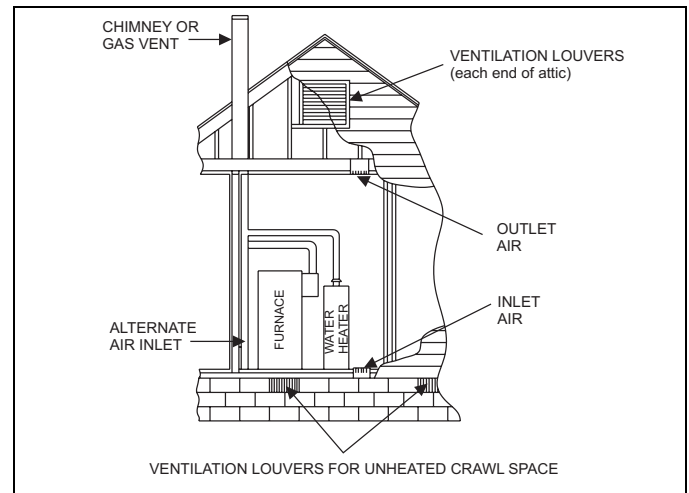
Alternate Air Intake, Air Outlet and Chimney Connections
